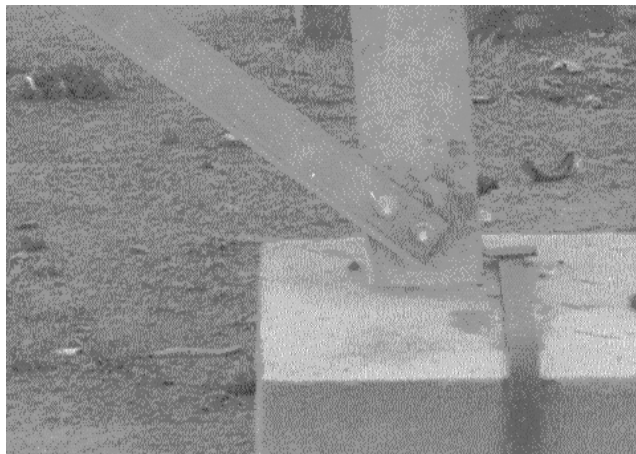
Retrofitted tower foundation with strap-on anchor
